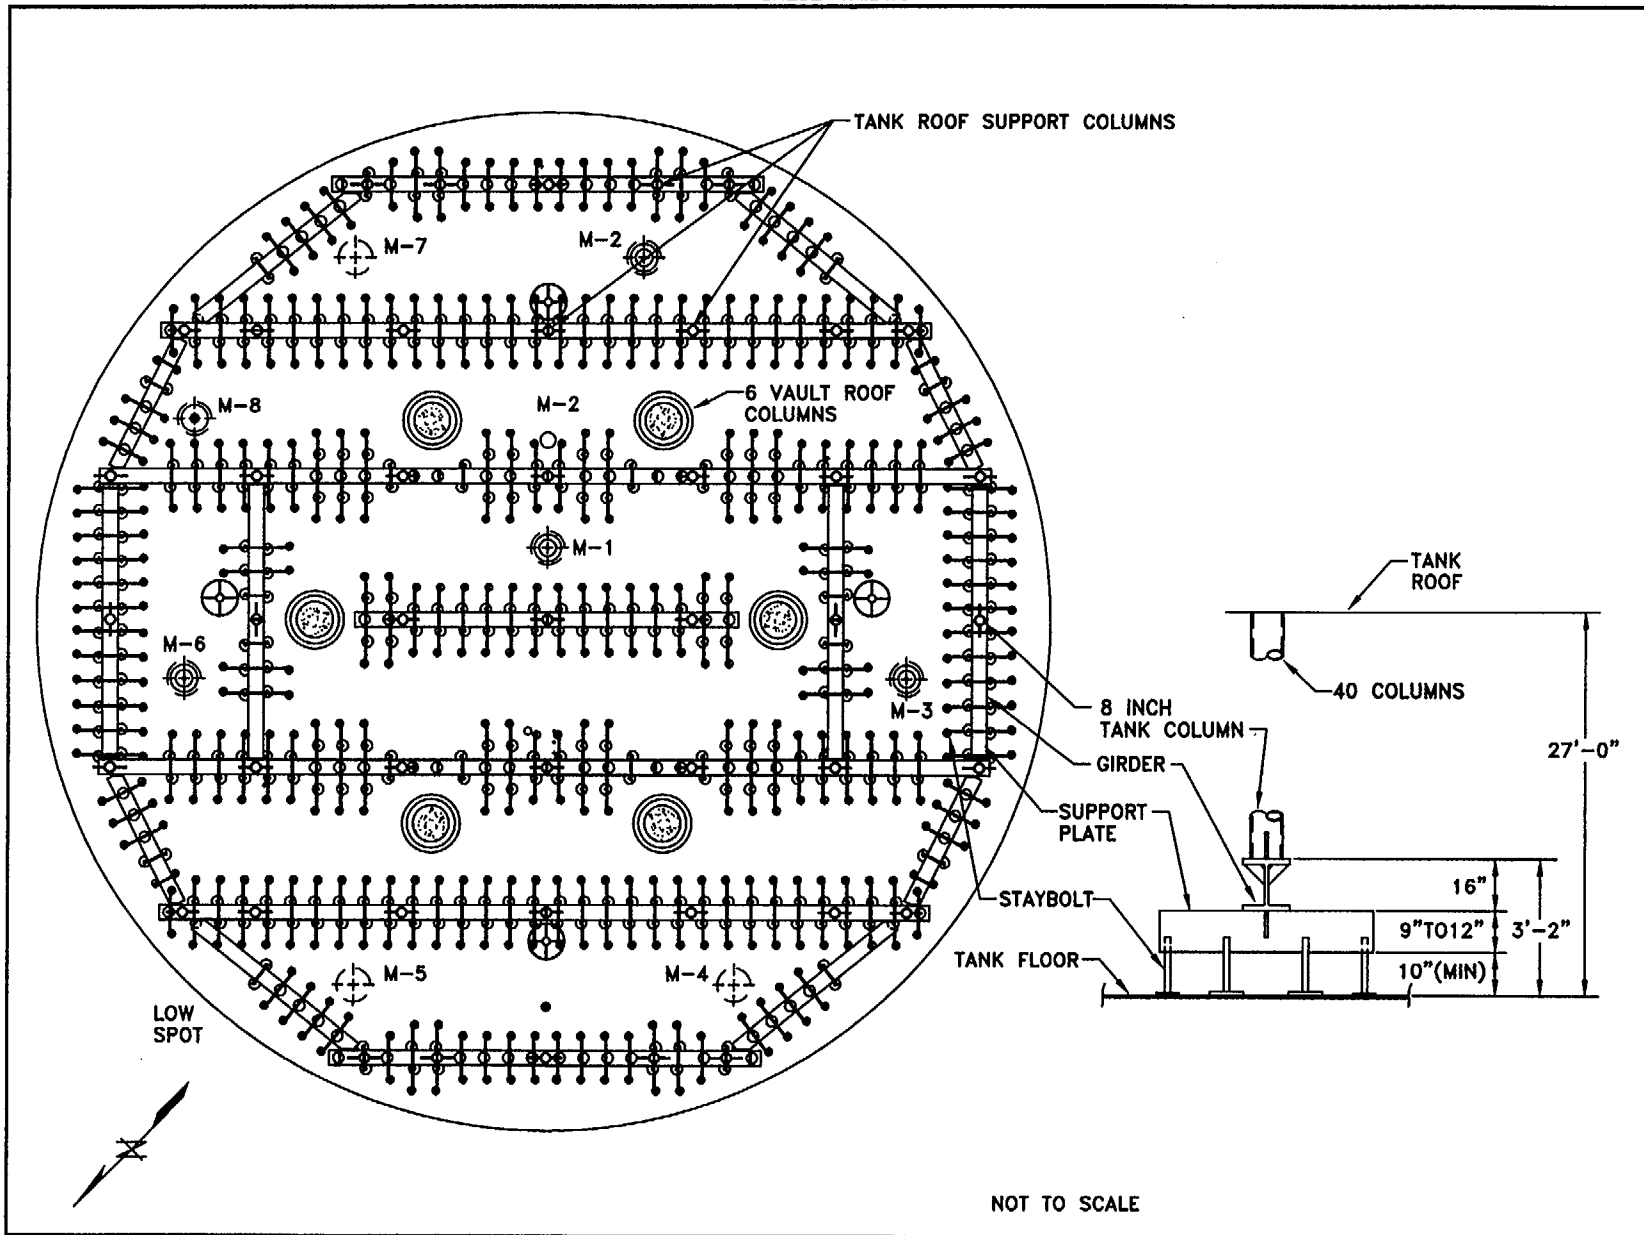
Purex HLW Tank Internal Floor Structure (Typ.) (Tank 8D-1 Shown)
